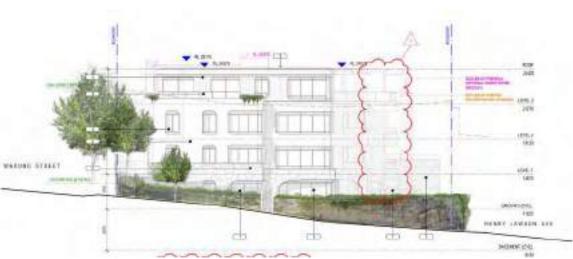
Extract of west elevation (Blues Point Road) showing LEP 8.5m height line (Source: Squillace Architecture, Project No. HIG2307, Sept 2024)
